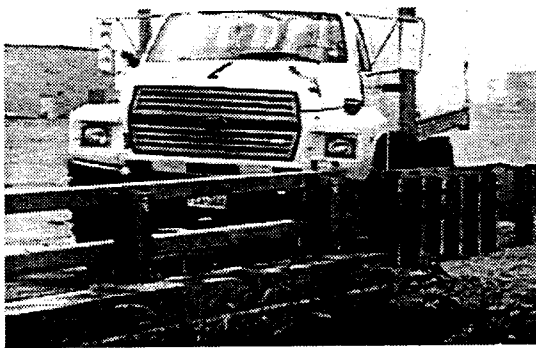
Sequential photographs for test 404311-6 (overhead and frontal views) (continued).
